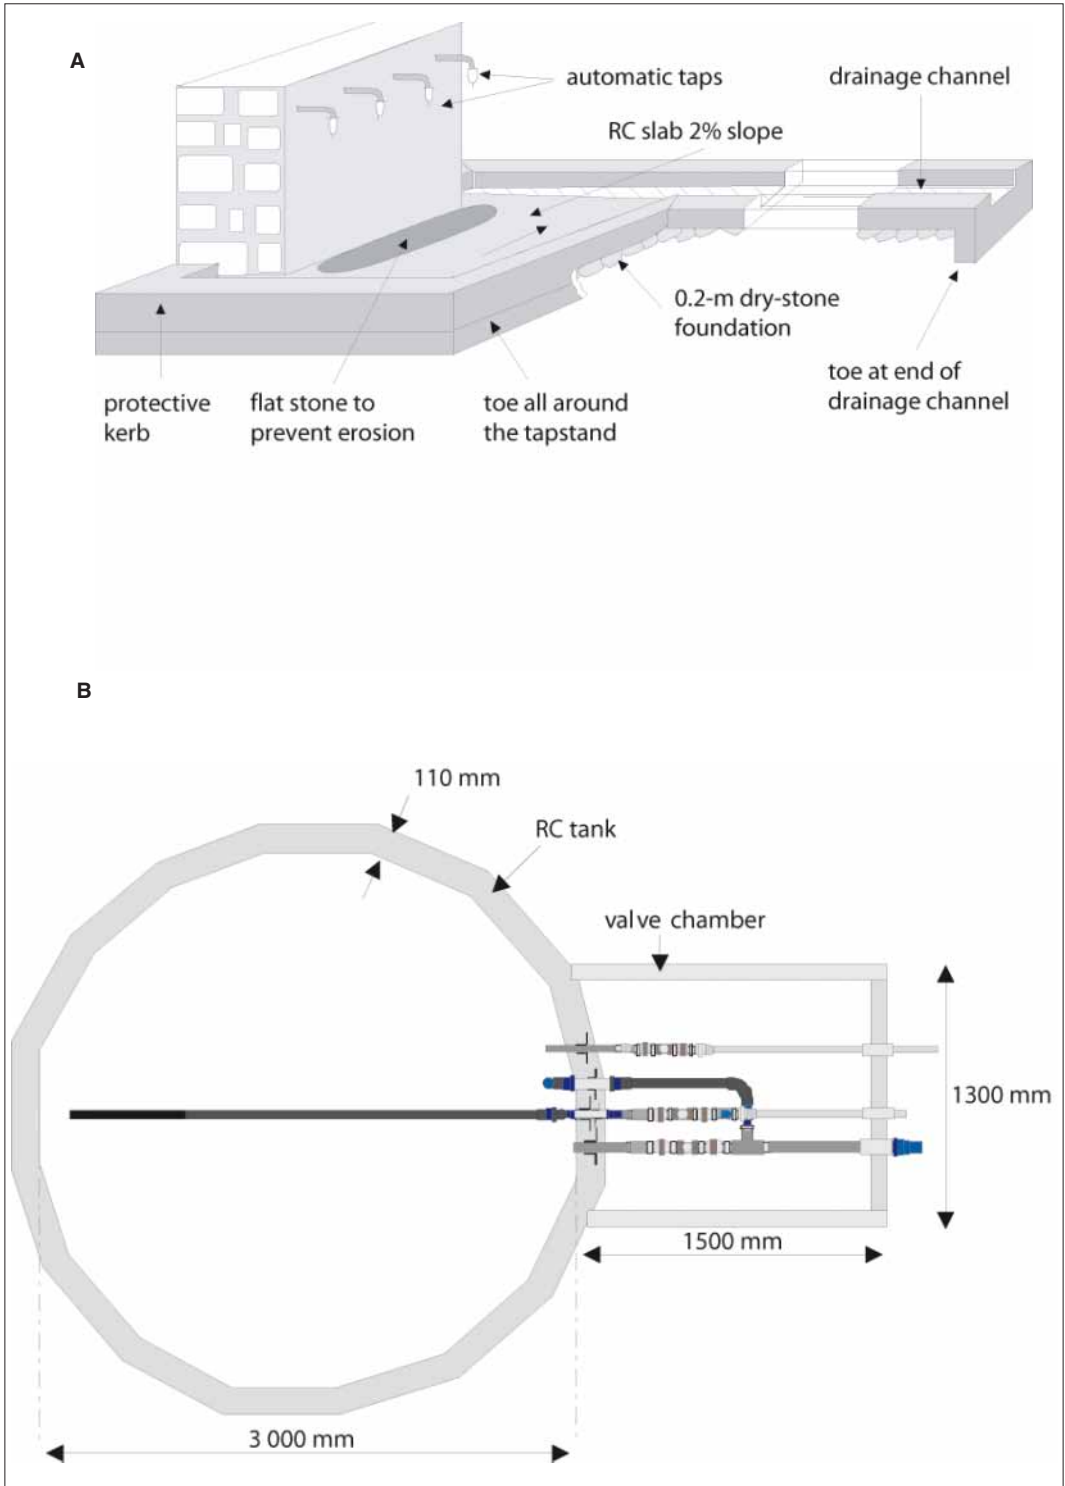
Reinforced concrete tank (ACF, Laos, 1998).
